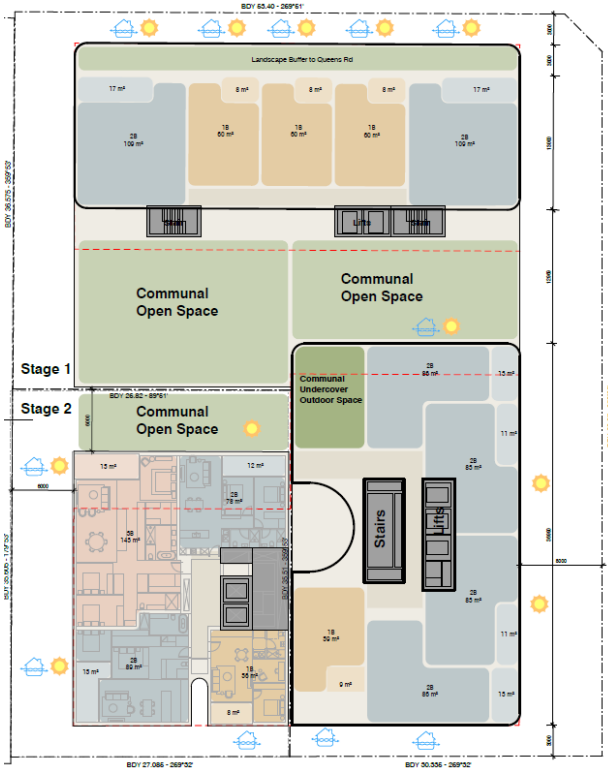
Proposed level 1 floor plan (Indicative Design Concept)
